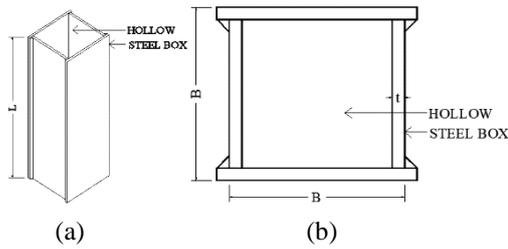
Hollow specimen (a) cross section (b) isometric view
